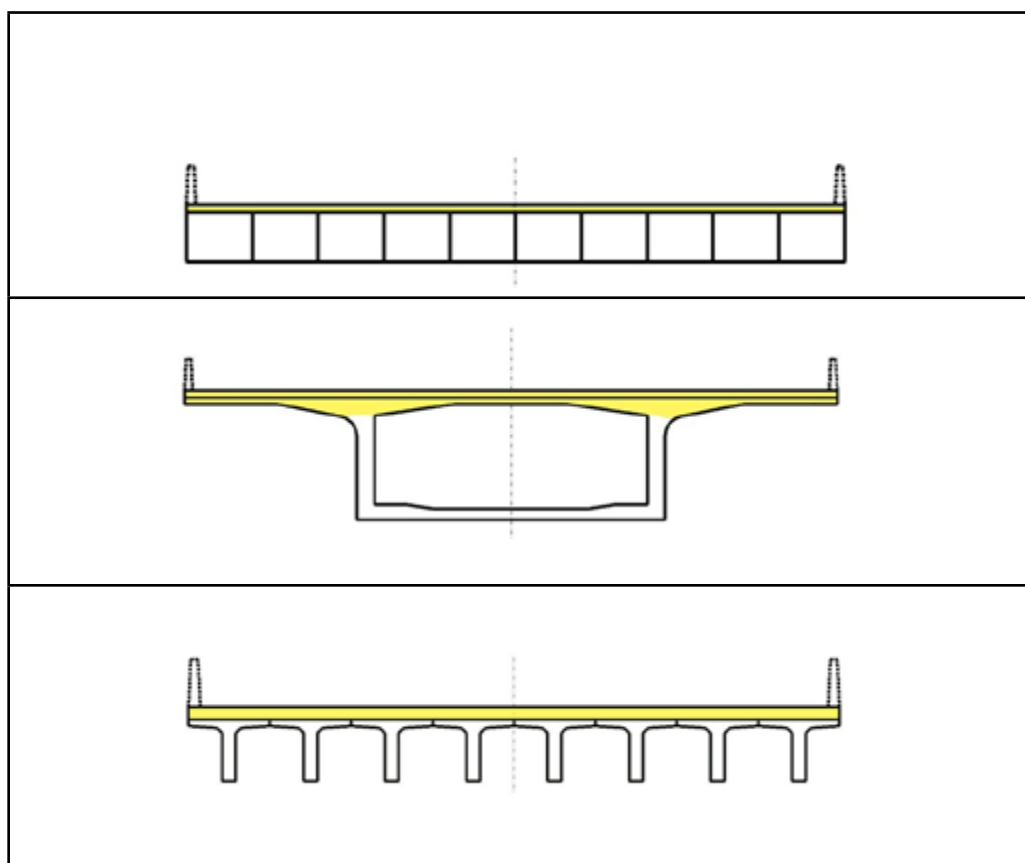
Prestressed Concrete Deck (Highlighted)
